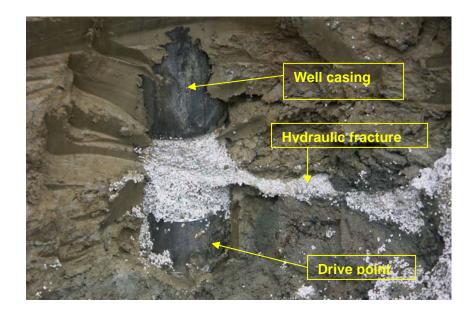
Picture of drive point, well casing and the resulting sand filled hydraulic fracture in excavation of cell 5.
